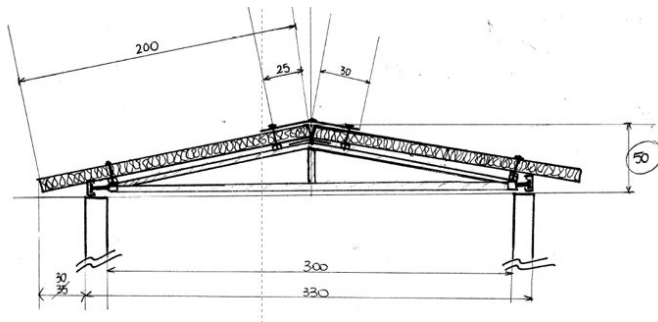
Detailed view of the observatory roof plan with key design parameters. The final roof structure was designed and executed by the contracted metalworker, and thus is not identical to the original design shown here.
